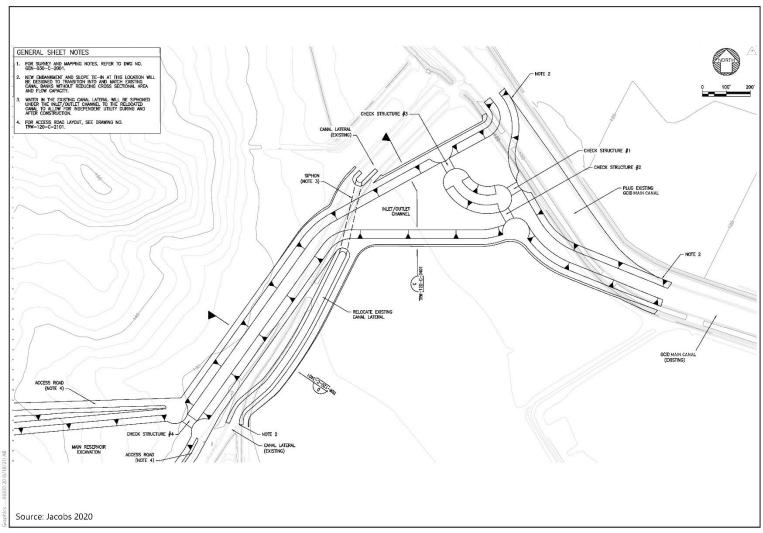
C-63C Terminal Regulating Reservoir West Inlet/Outlet Canal Plan
